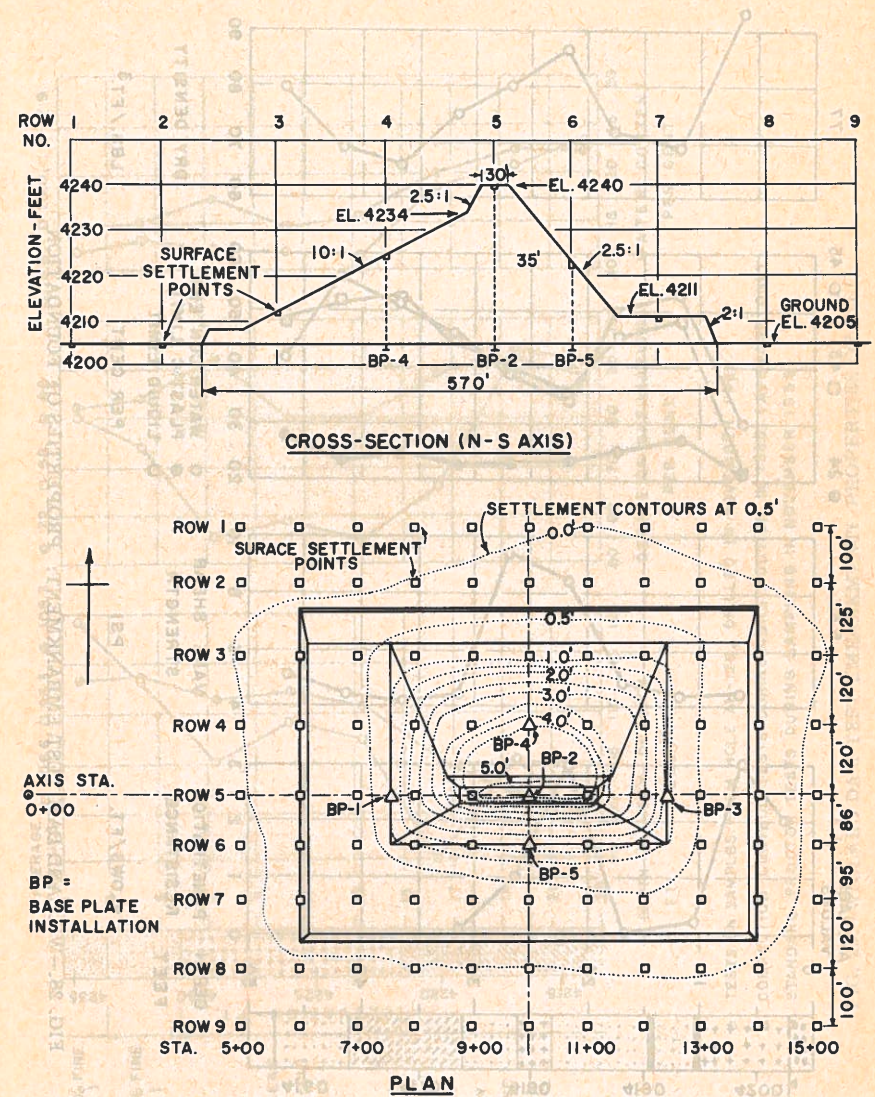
WILLARD DAM TEST EMBANKMENT
